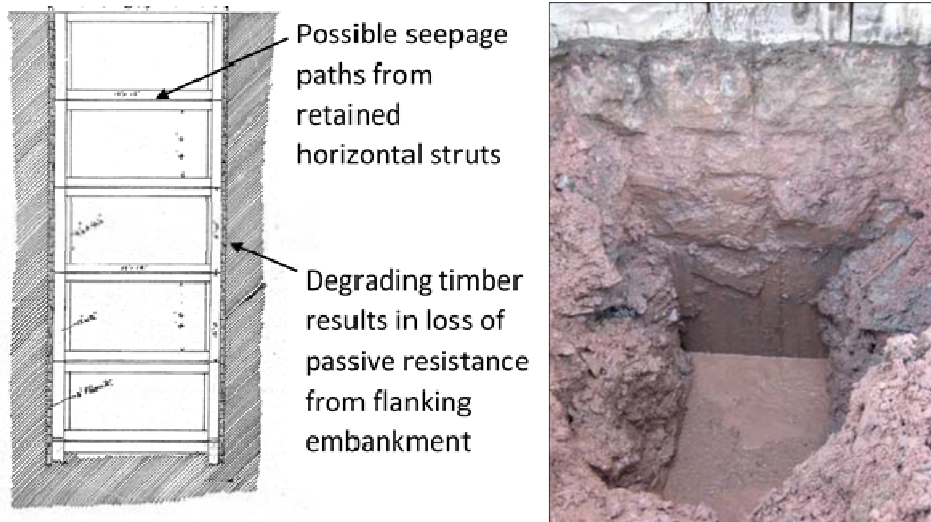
Evidence of timber formwork in trial pit, related back to record drawings
